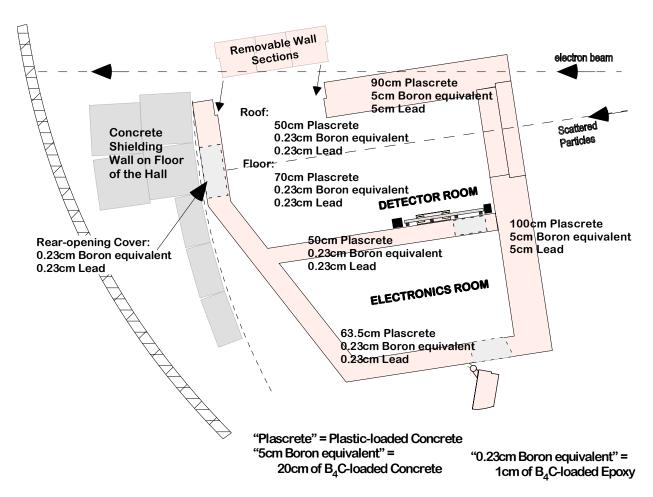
Plan View of the SHMS Shield House showing the layout, thickness, and composition of the walls.
